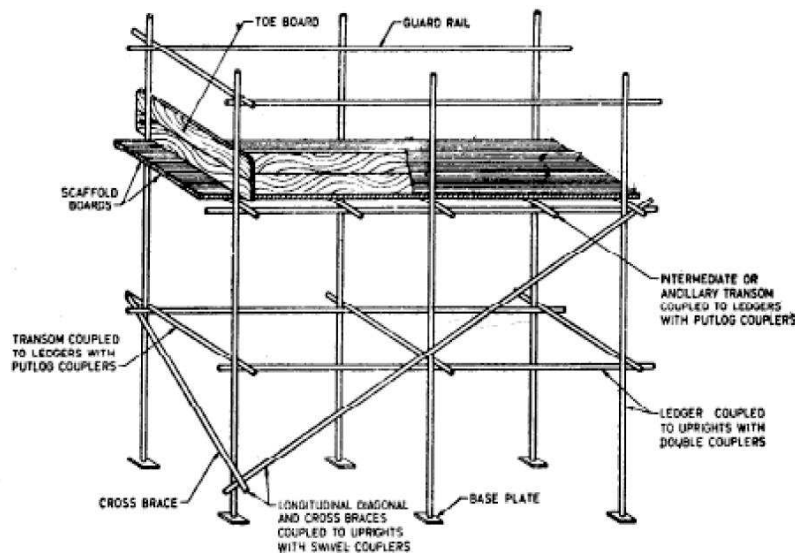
TYPICAL SKETCH OF INDEPENDENT SCAFFOLD (INDIVIDUAL COMPONENT TYPE)
